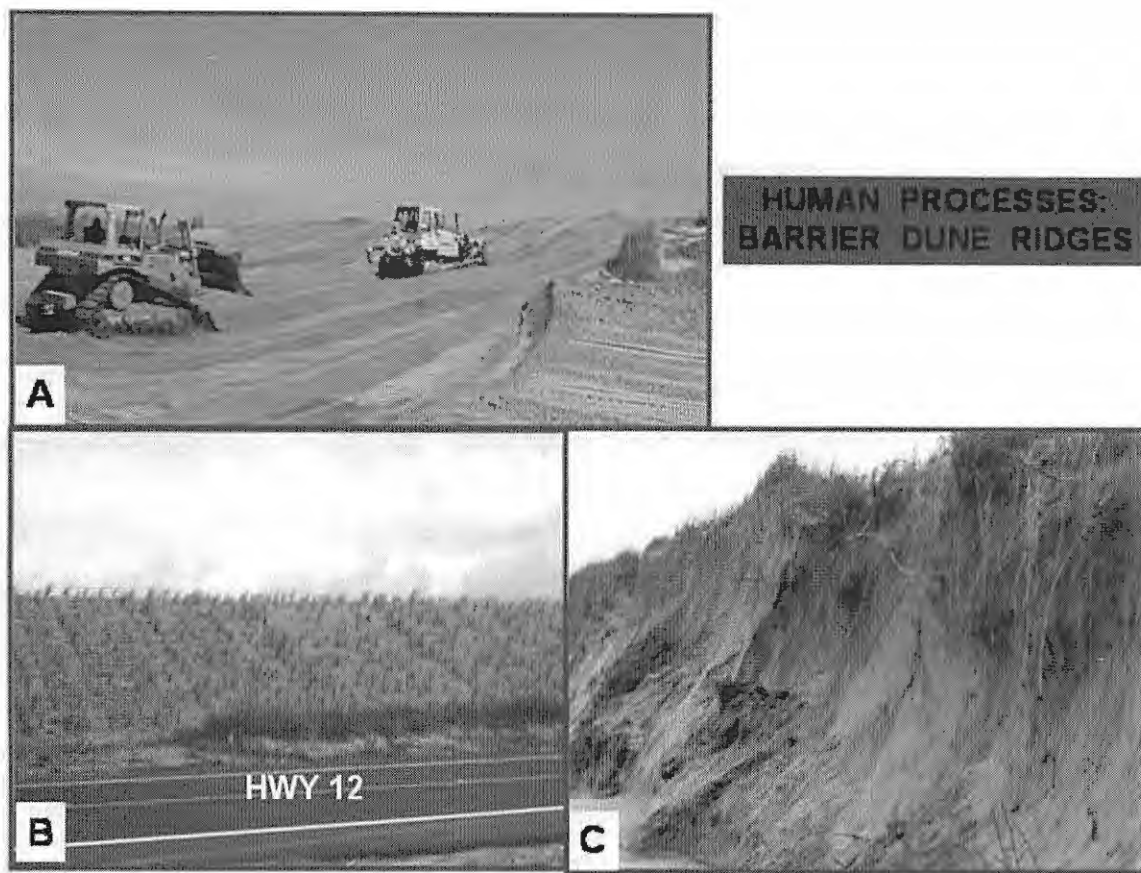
Panel A. Photo shows N.C. Department of Transportation bulldozers rebuilding a new barrier dune ridge after Hurricane Isabel in 2003. Panel B. Looking east at the newly constructed and vegetated barrier-dune ridge built to protect the post-Hurricane Dennis relocated N.C. Hwy. 12 (Figure 2-2B). Panel C. Photograph of the ocean side of a recently constructed barrier dune ridge that shows severe erosion and scarping of the barrier dune ridge that is totally out of equilibrium with the ocean dynamics. Photographs are by S. Riggs.
